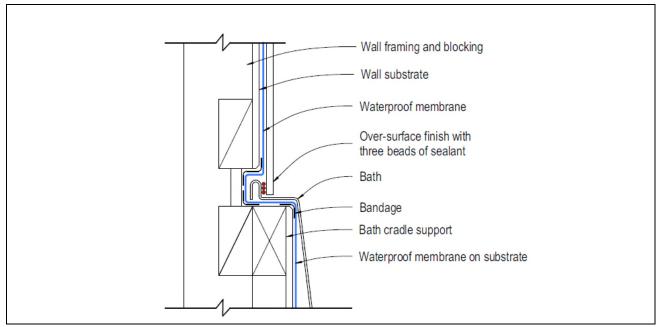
Bath sealed to wall, membrane behind over-surface finish
